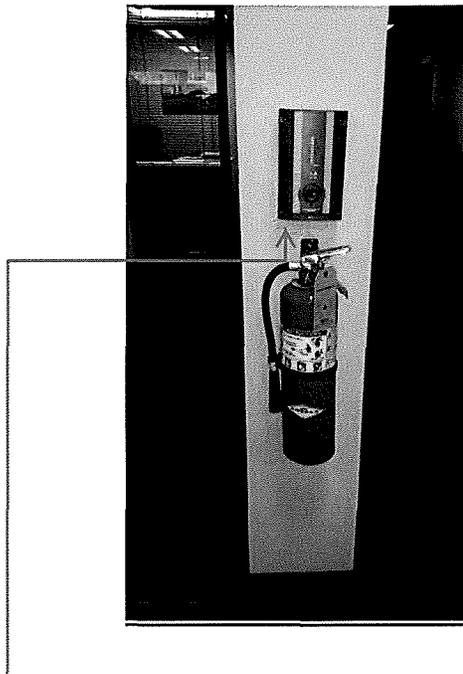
1301 Canal; stand-alone methane detector, column K5.
